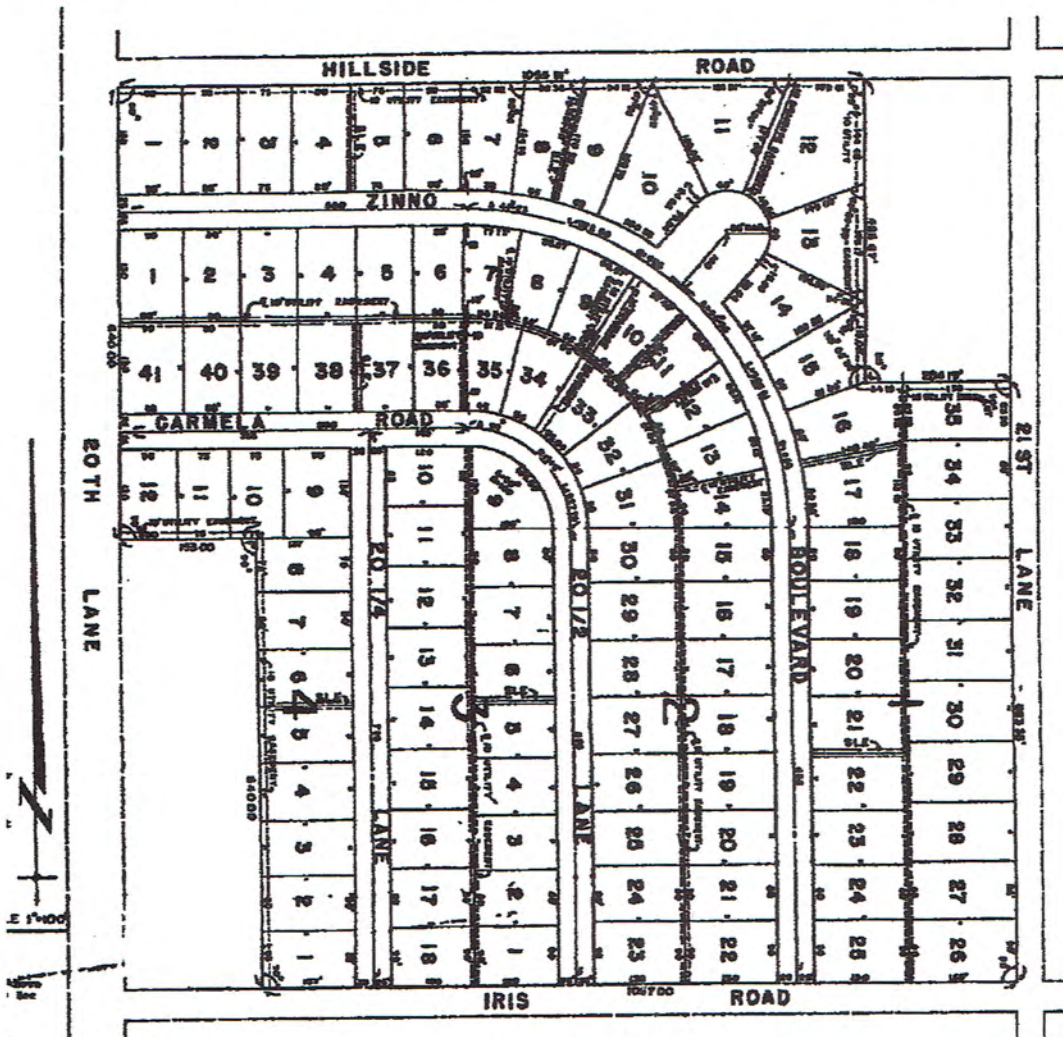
Exhibit G – Copy of Plat for Zinno's Subdivision, First Filing
